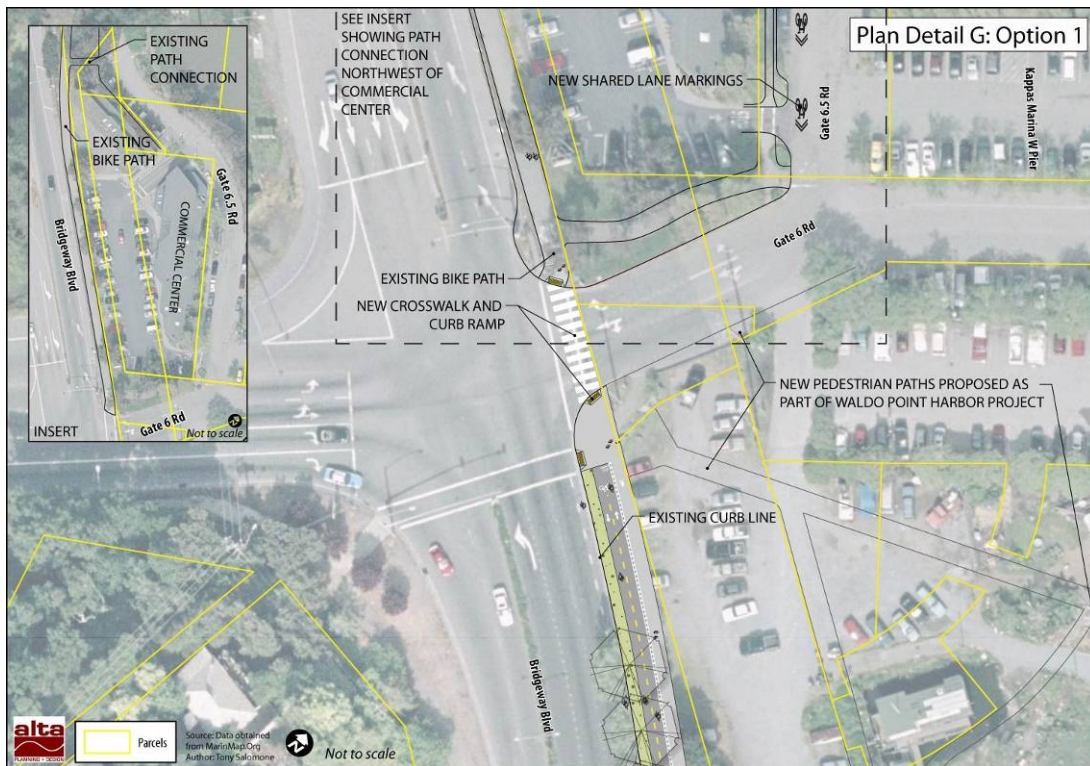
Gate 6 Road Intersection Improvement Option A
